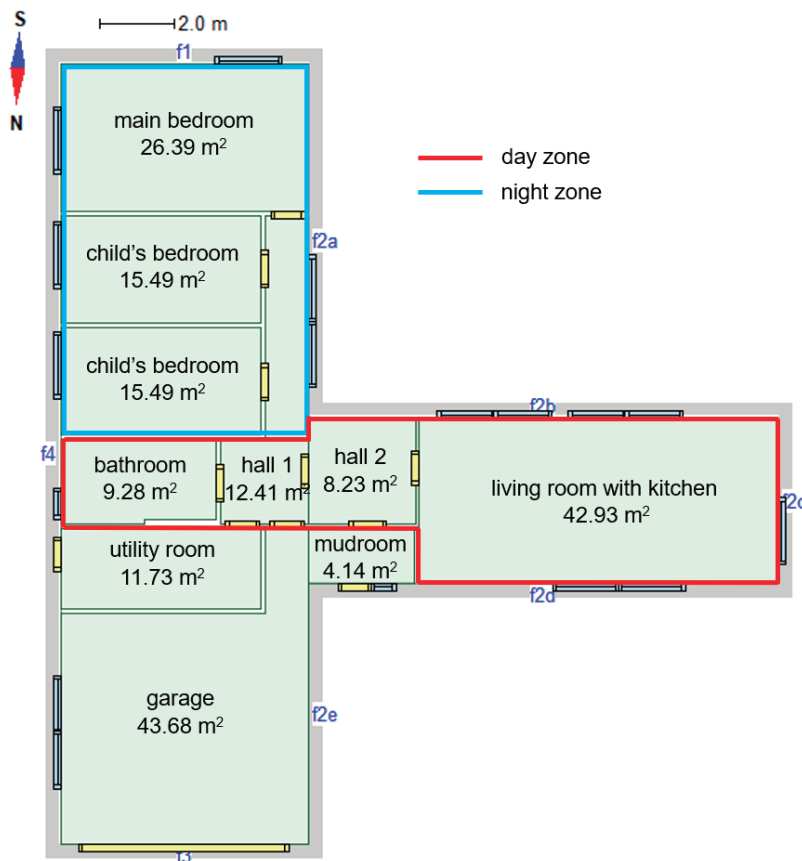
Floor plan of the designed building, created using IDA ICE 4.8 software.
